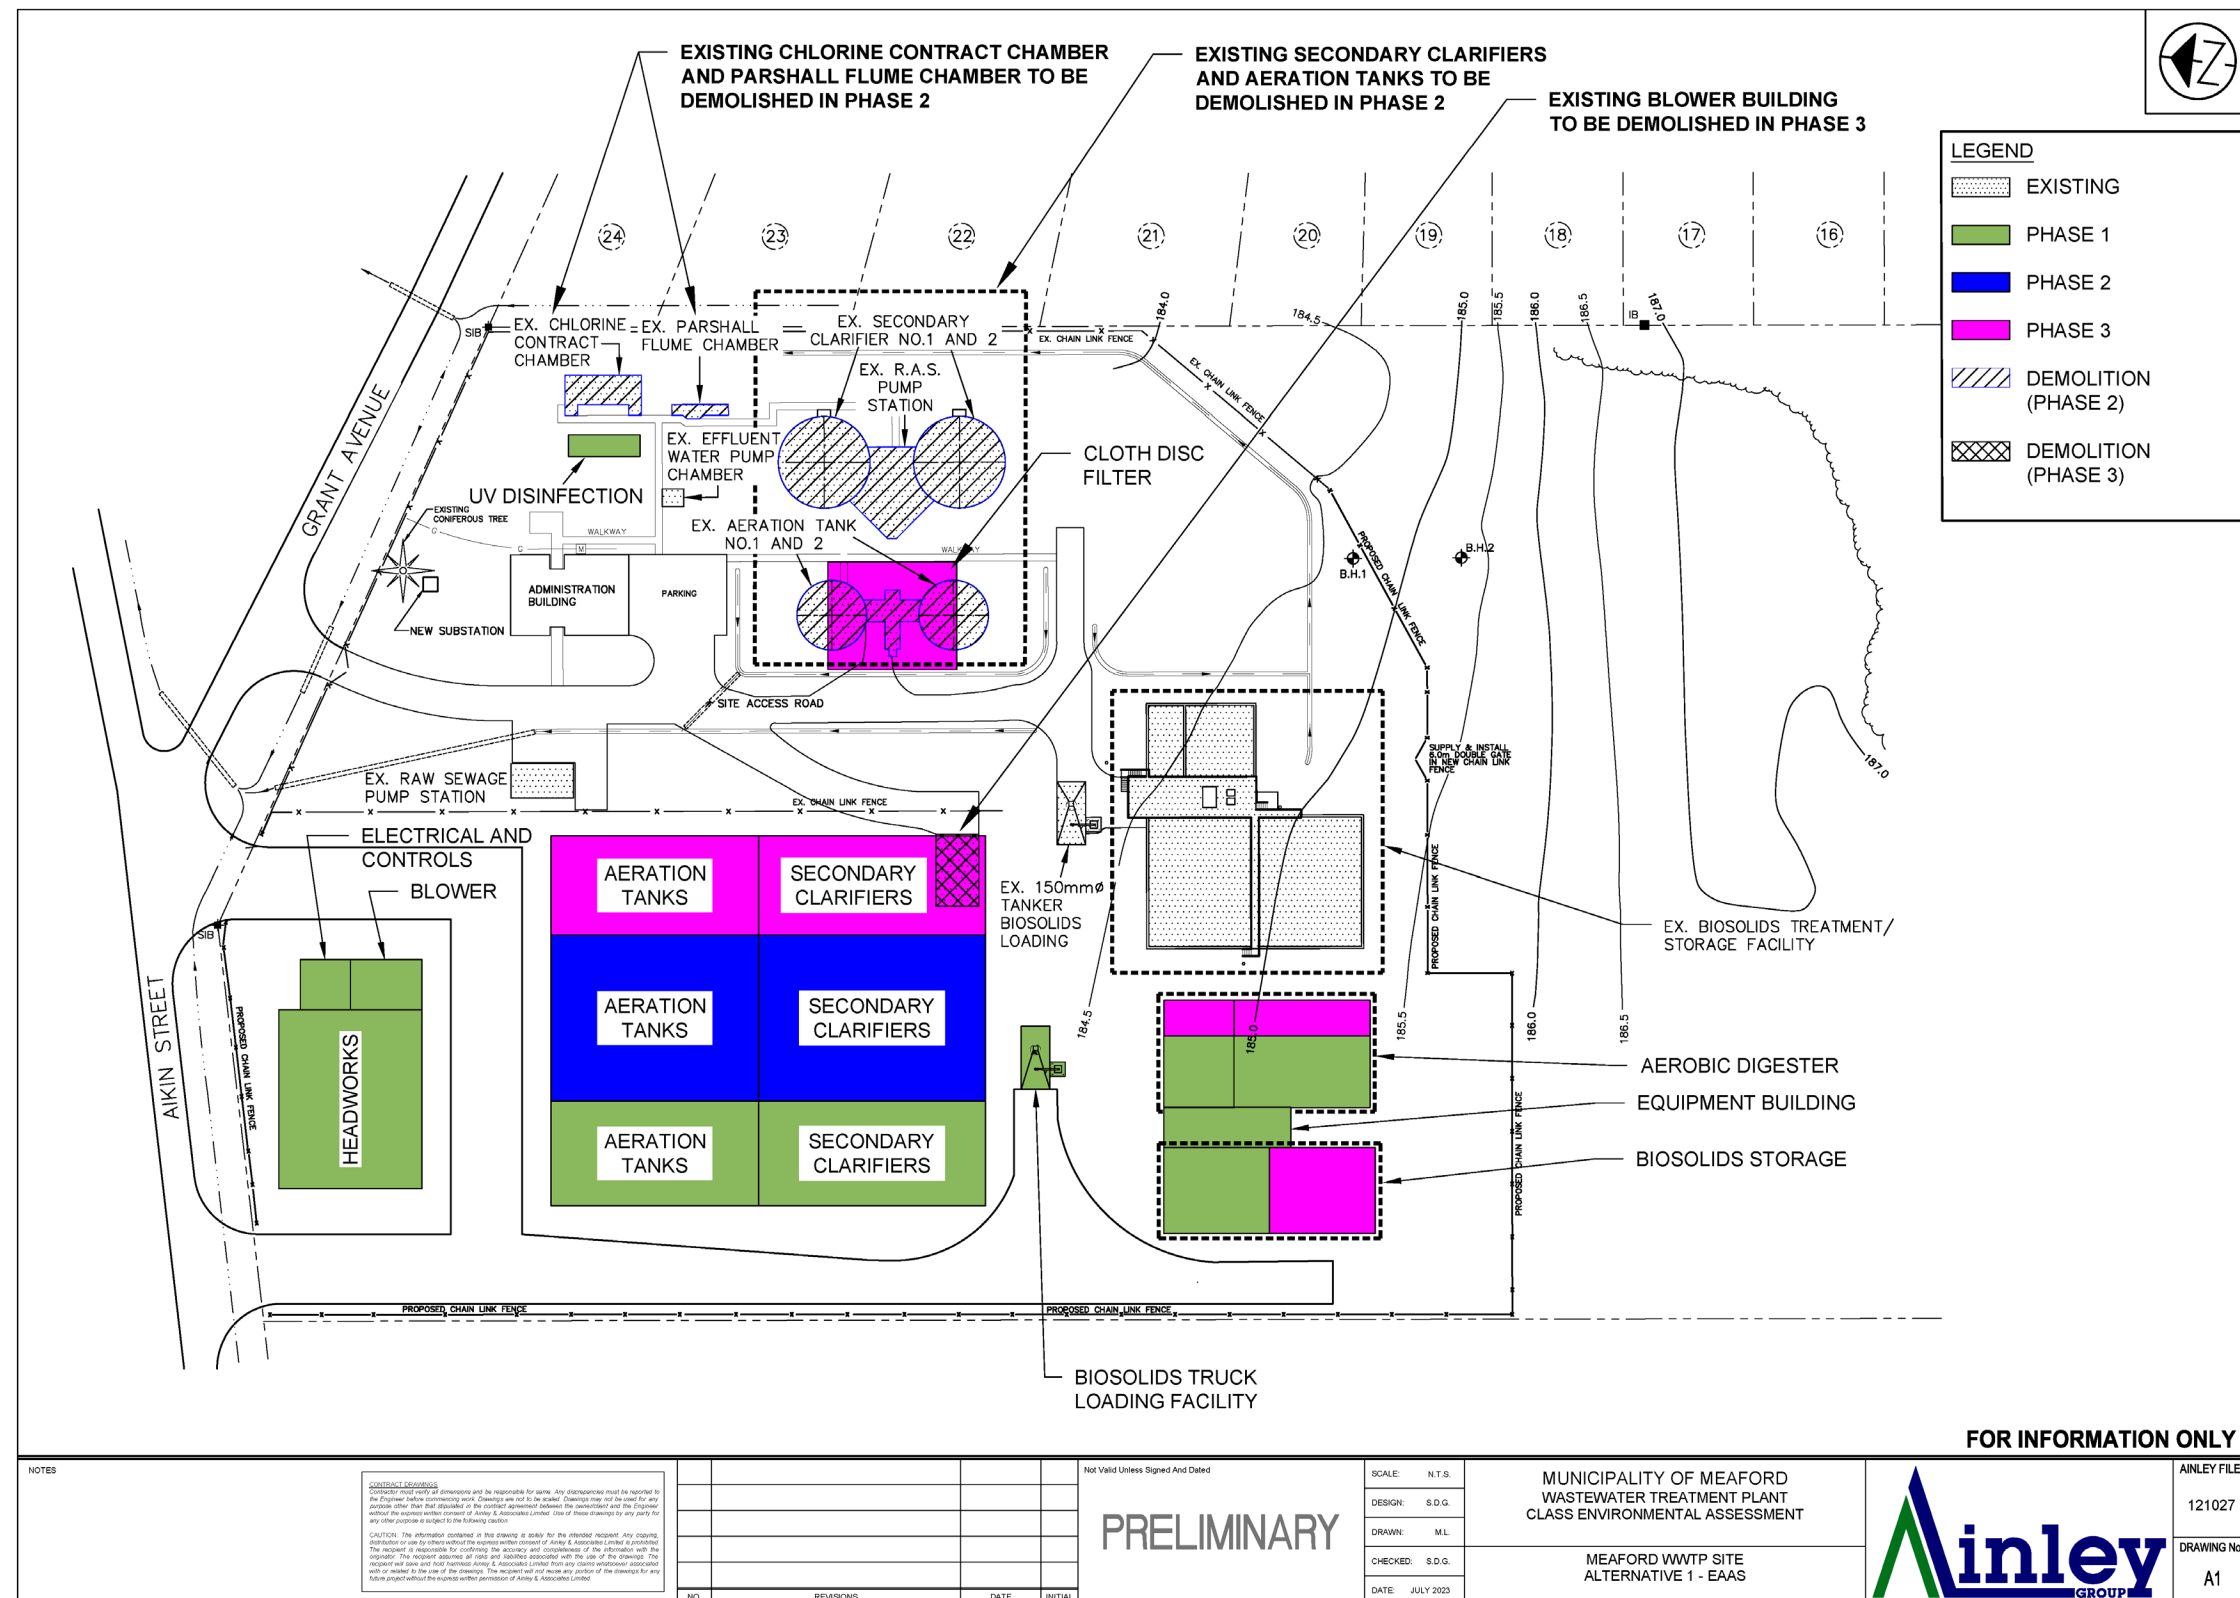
Conceptual Site Layout of Preliminary Preferred Alternatives
